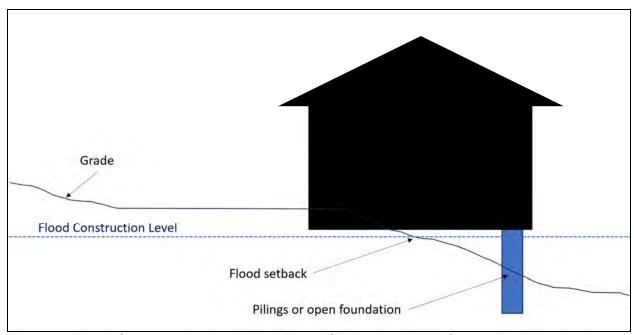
Flood Construction Level and Flood Setback suitable for tsunami prone sites
